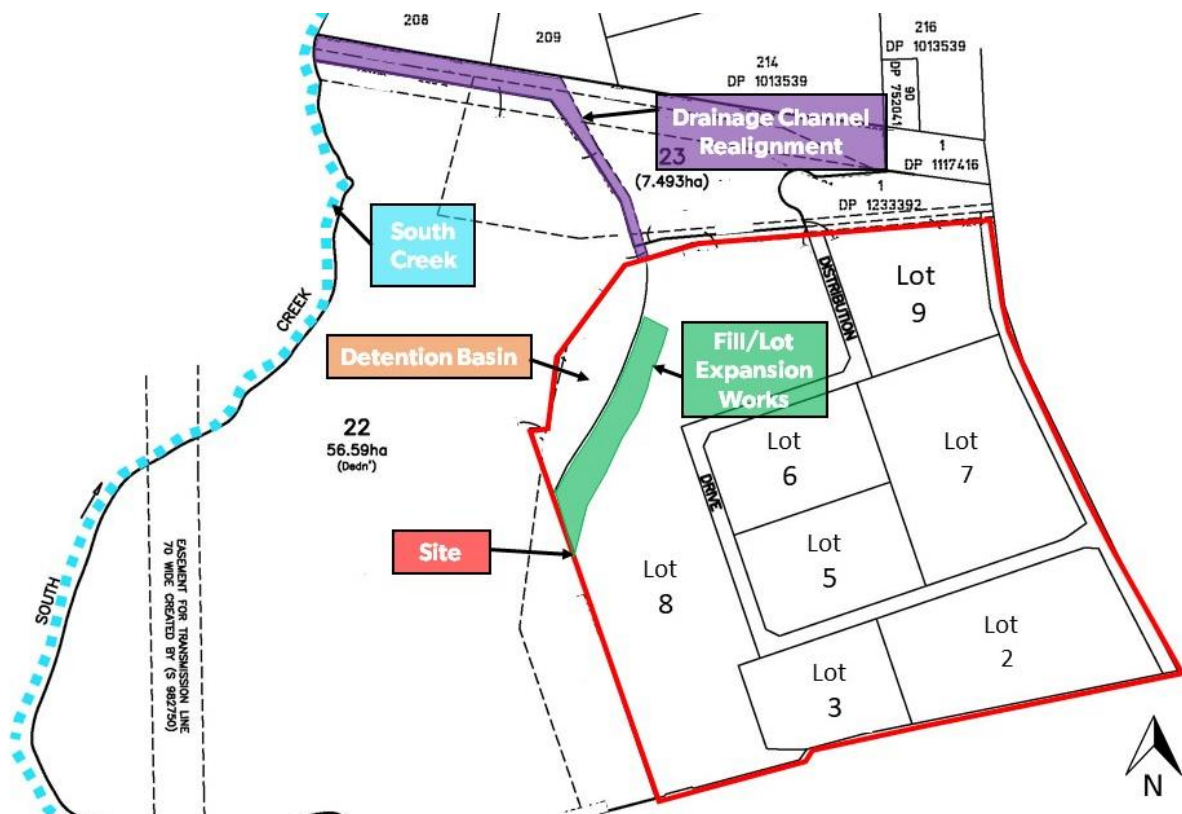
| Approved Subdivision Plan with Proposed Modifications
